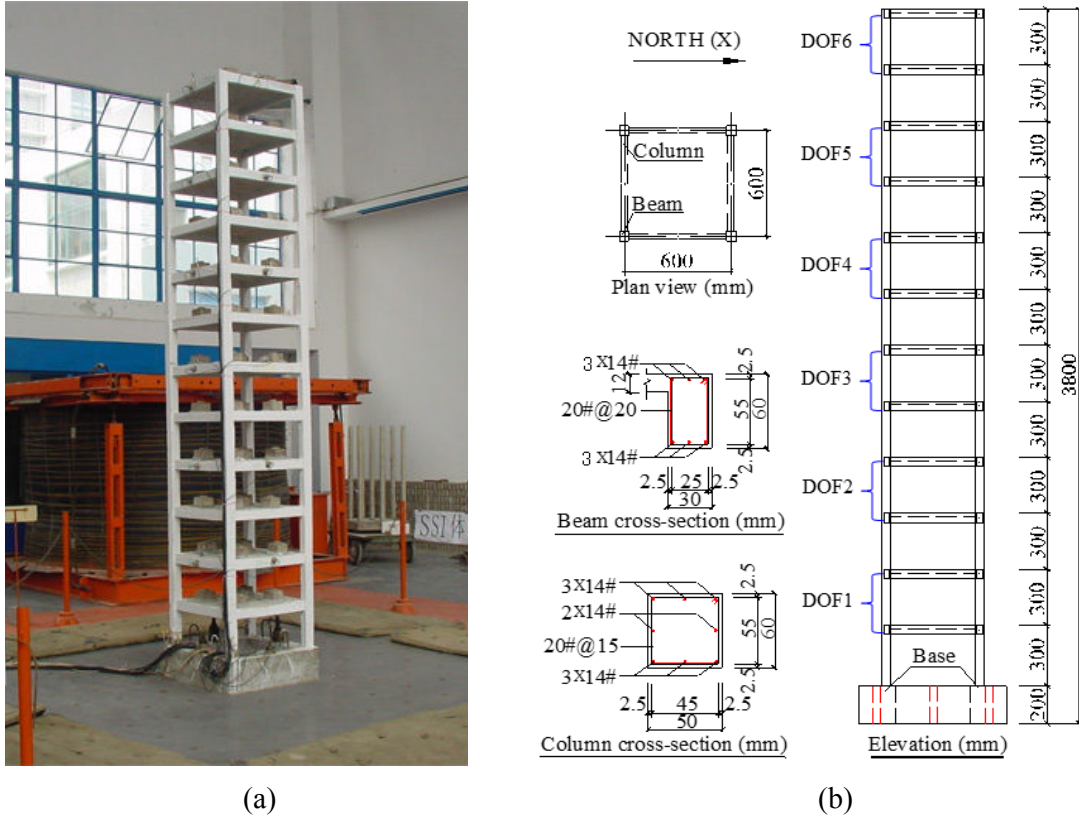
(a) Photo of shaking table test of RC frame model, and (b) Elevation of the testing RC frame model.
